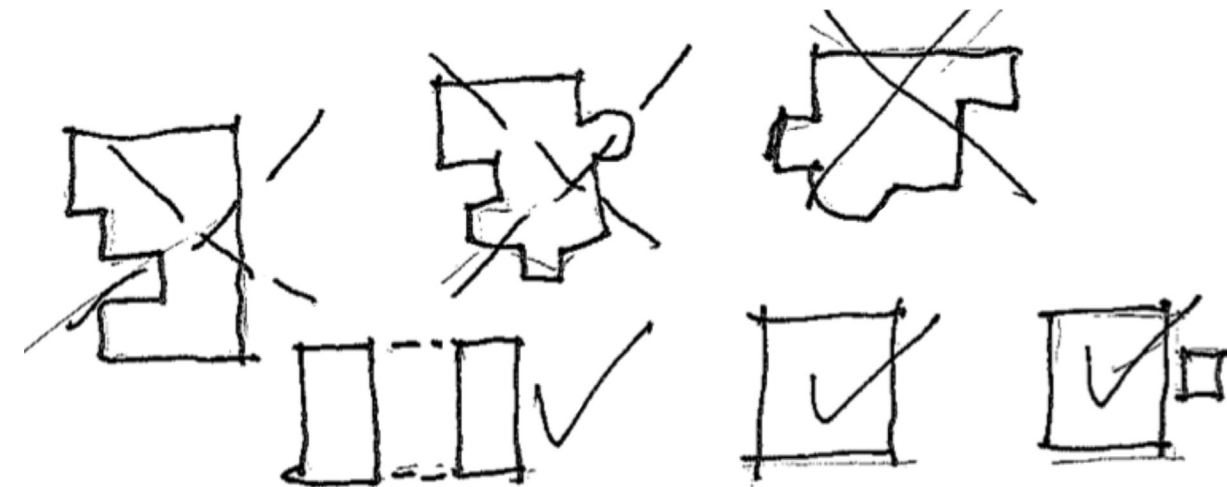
Example of simple plan (illustrates locations of shear walls, columns).
